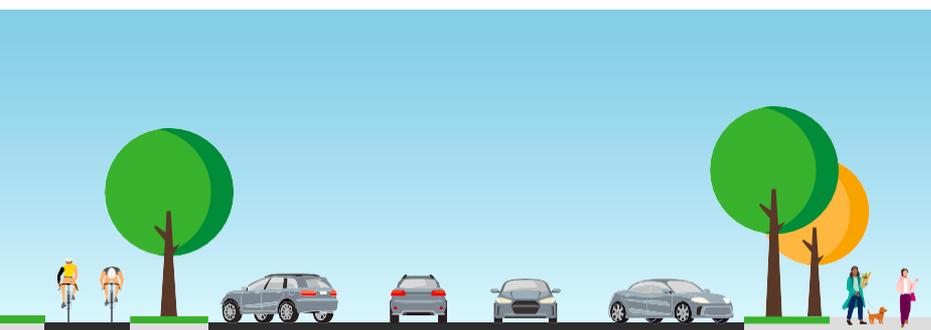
Typical road cross-section - Streets with high parking demand, such as Steiglitz, Walsh & Atkinson Streets.
